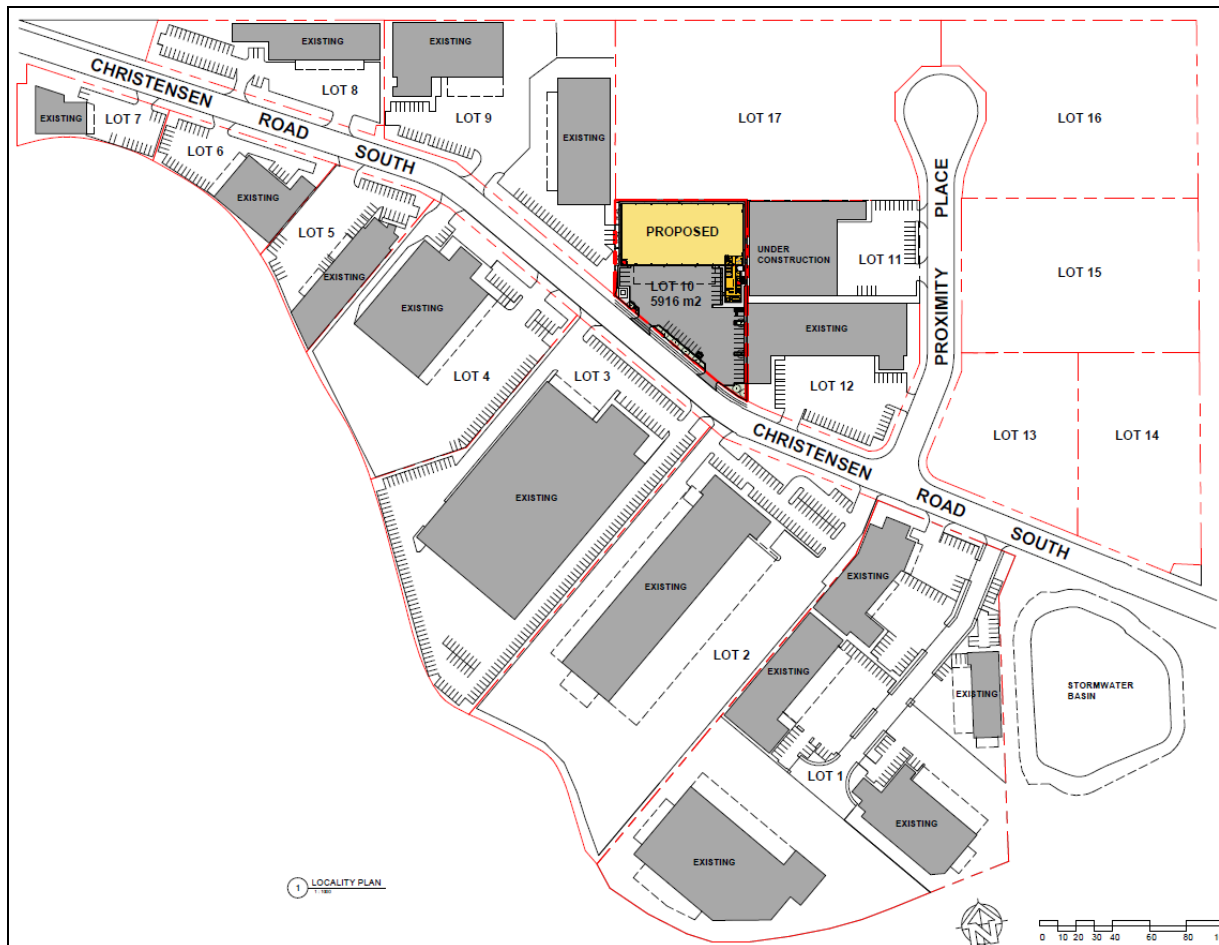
Site Plan showing location of future Lot 10 (Source: Multi Span Australia Design Construct)
